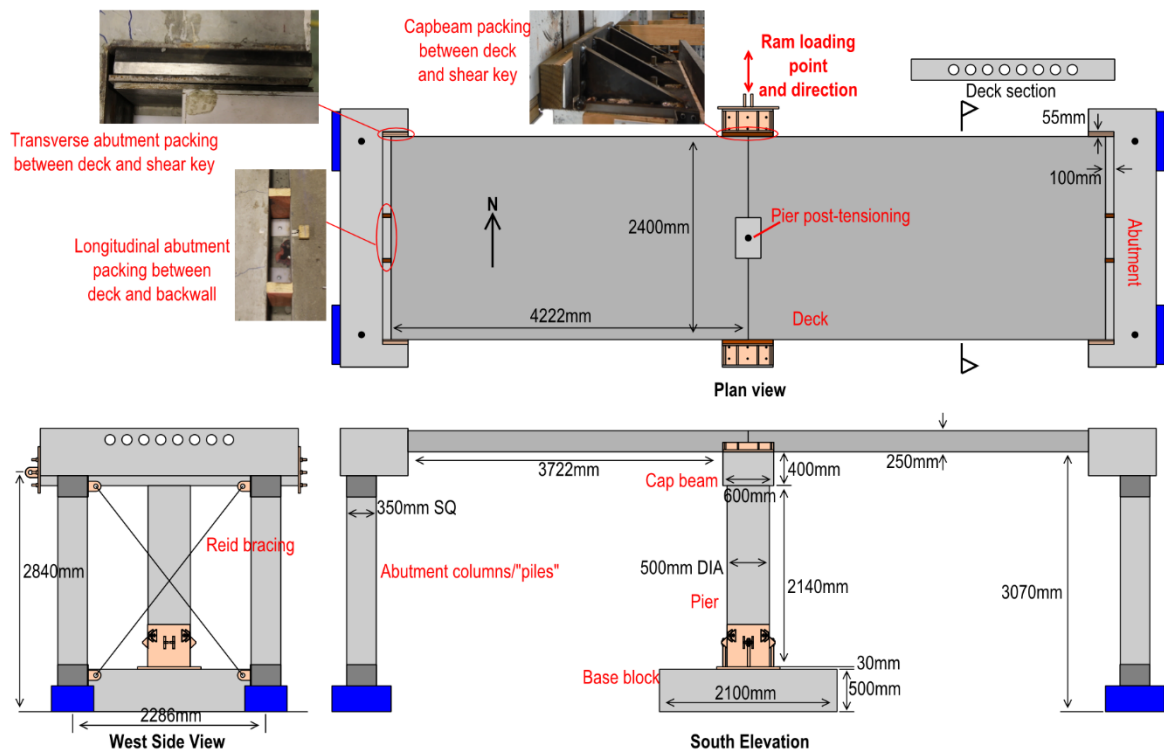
Overall specimen dimensions and detail regarding the boundary conditions around the decks.
